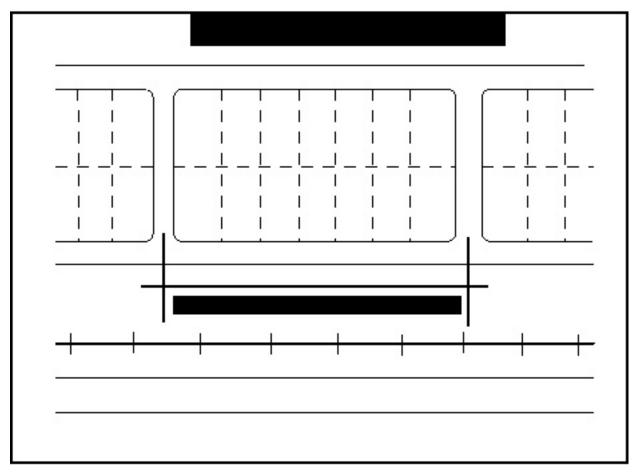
Block Length shall be between 400 feet and 1200 feet in length to provide adequate connectivity and traffic circulation.
